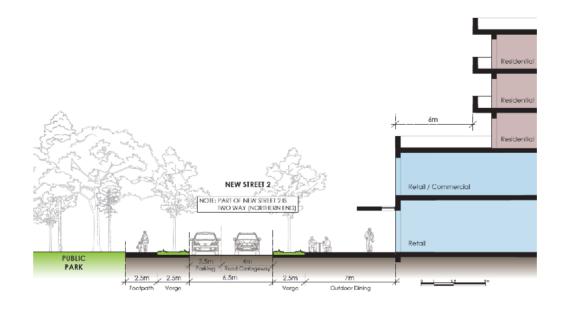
New Street 2 Setbacks – Southern End (Section D-D)
